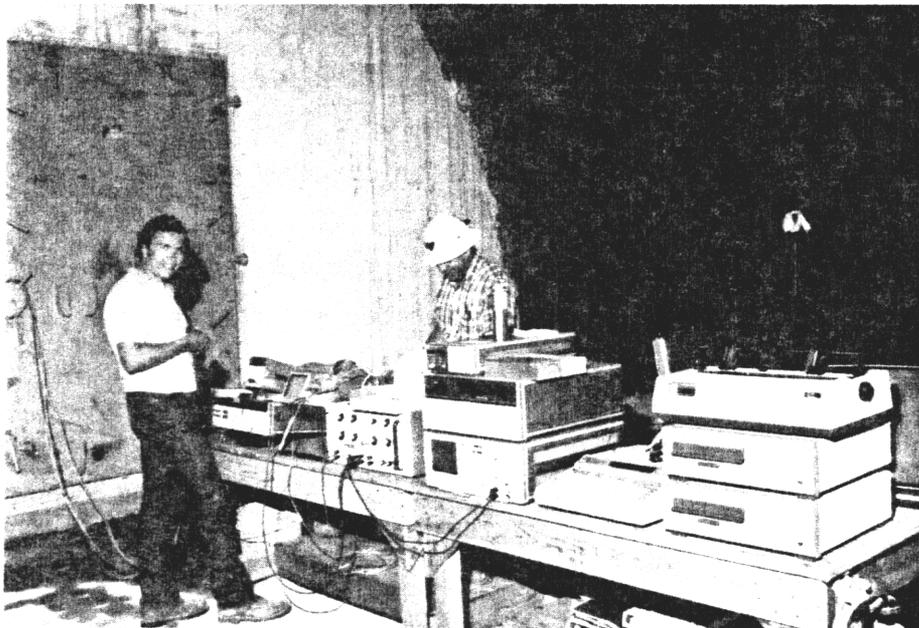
Data acquisition equipment in the access tunnel. (Note watertight door leading into spillway tunnel.)
